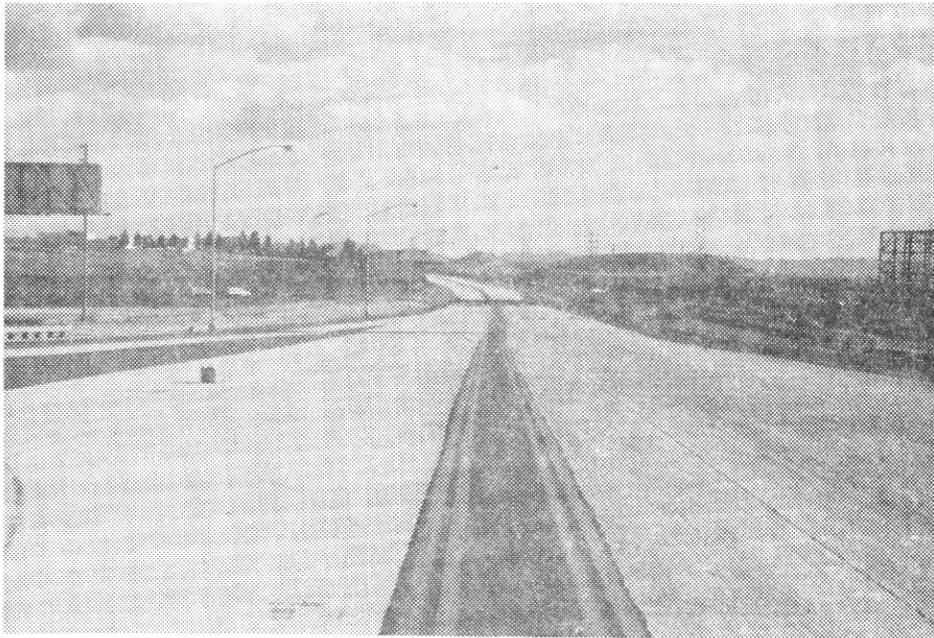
Looking south along Route 5. Note displacement of striping to right (west) caused by Juvenile Hall slide.
